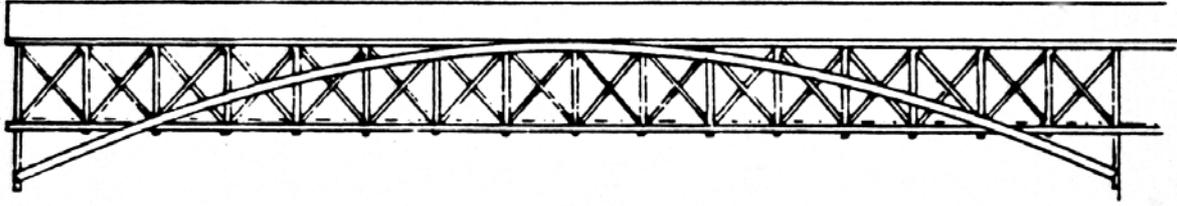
Burr truss at Waterford, New York, Theodor Burr, 1804. (James²)
